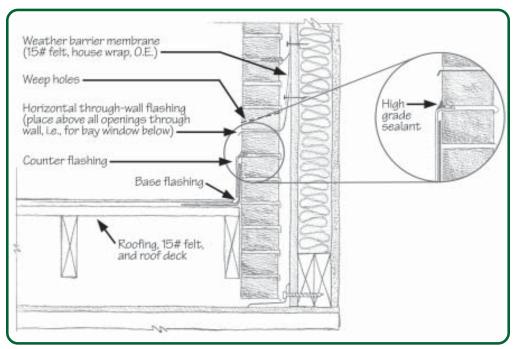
Brick Veneer Flashing at Roof Intersections
